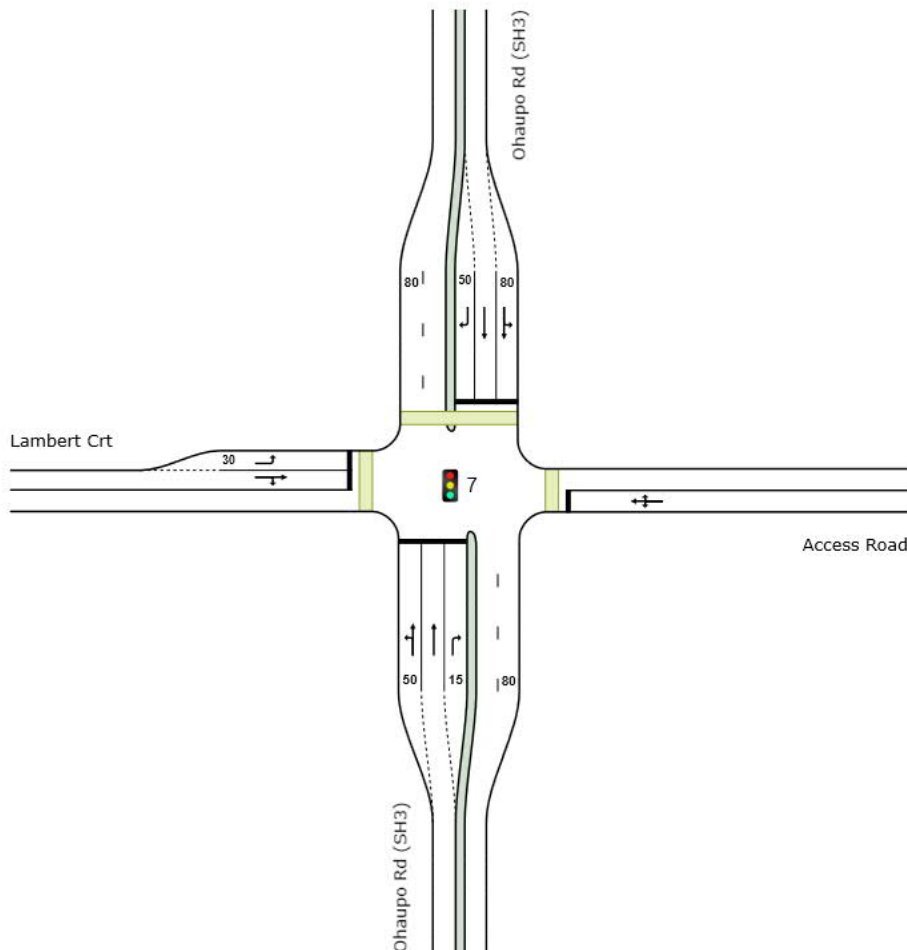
Ohaupo Road / Lambert Court / Access Lane Concept Intersection Upgrade.
